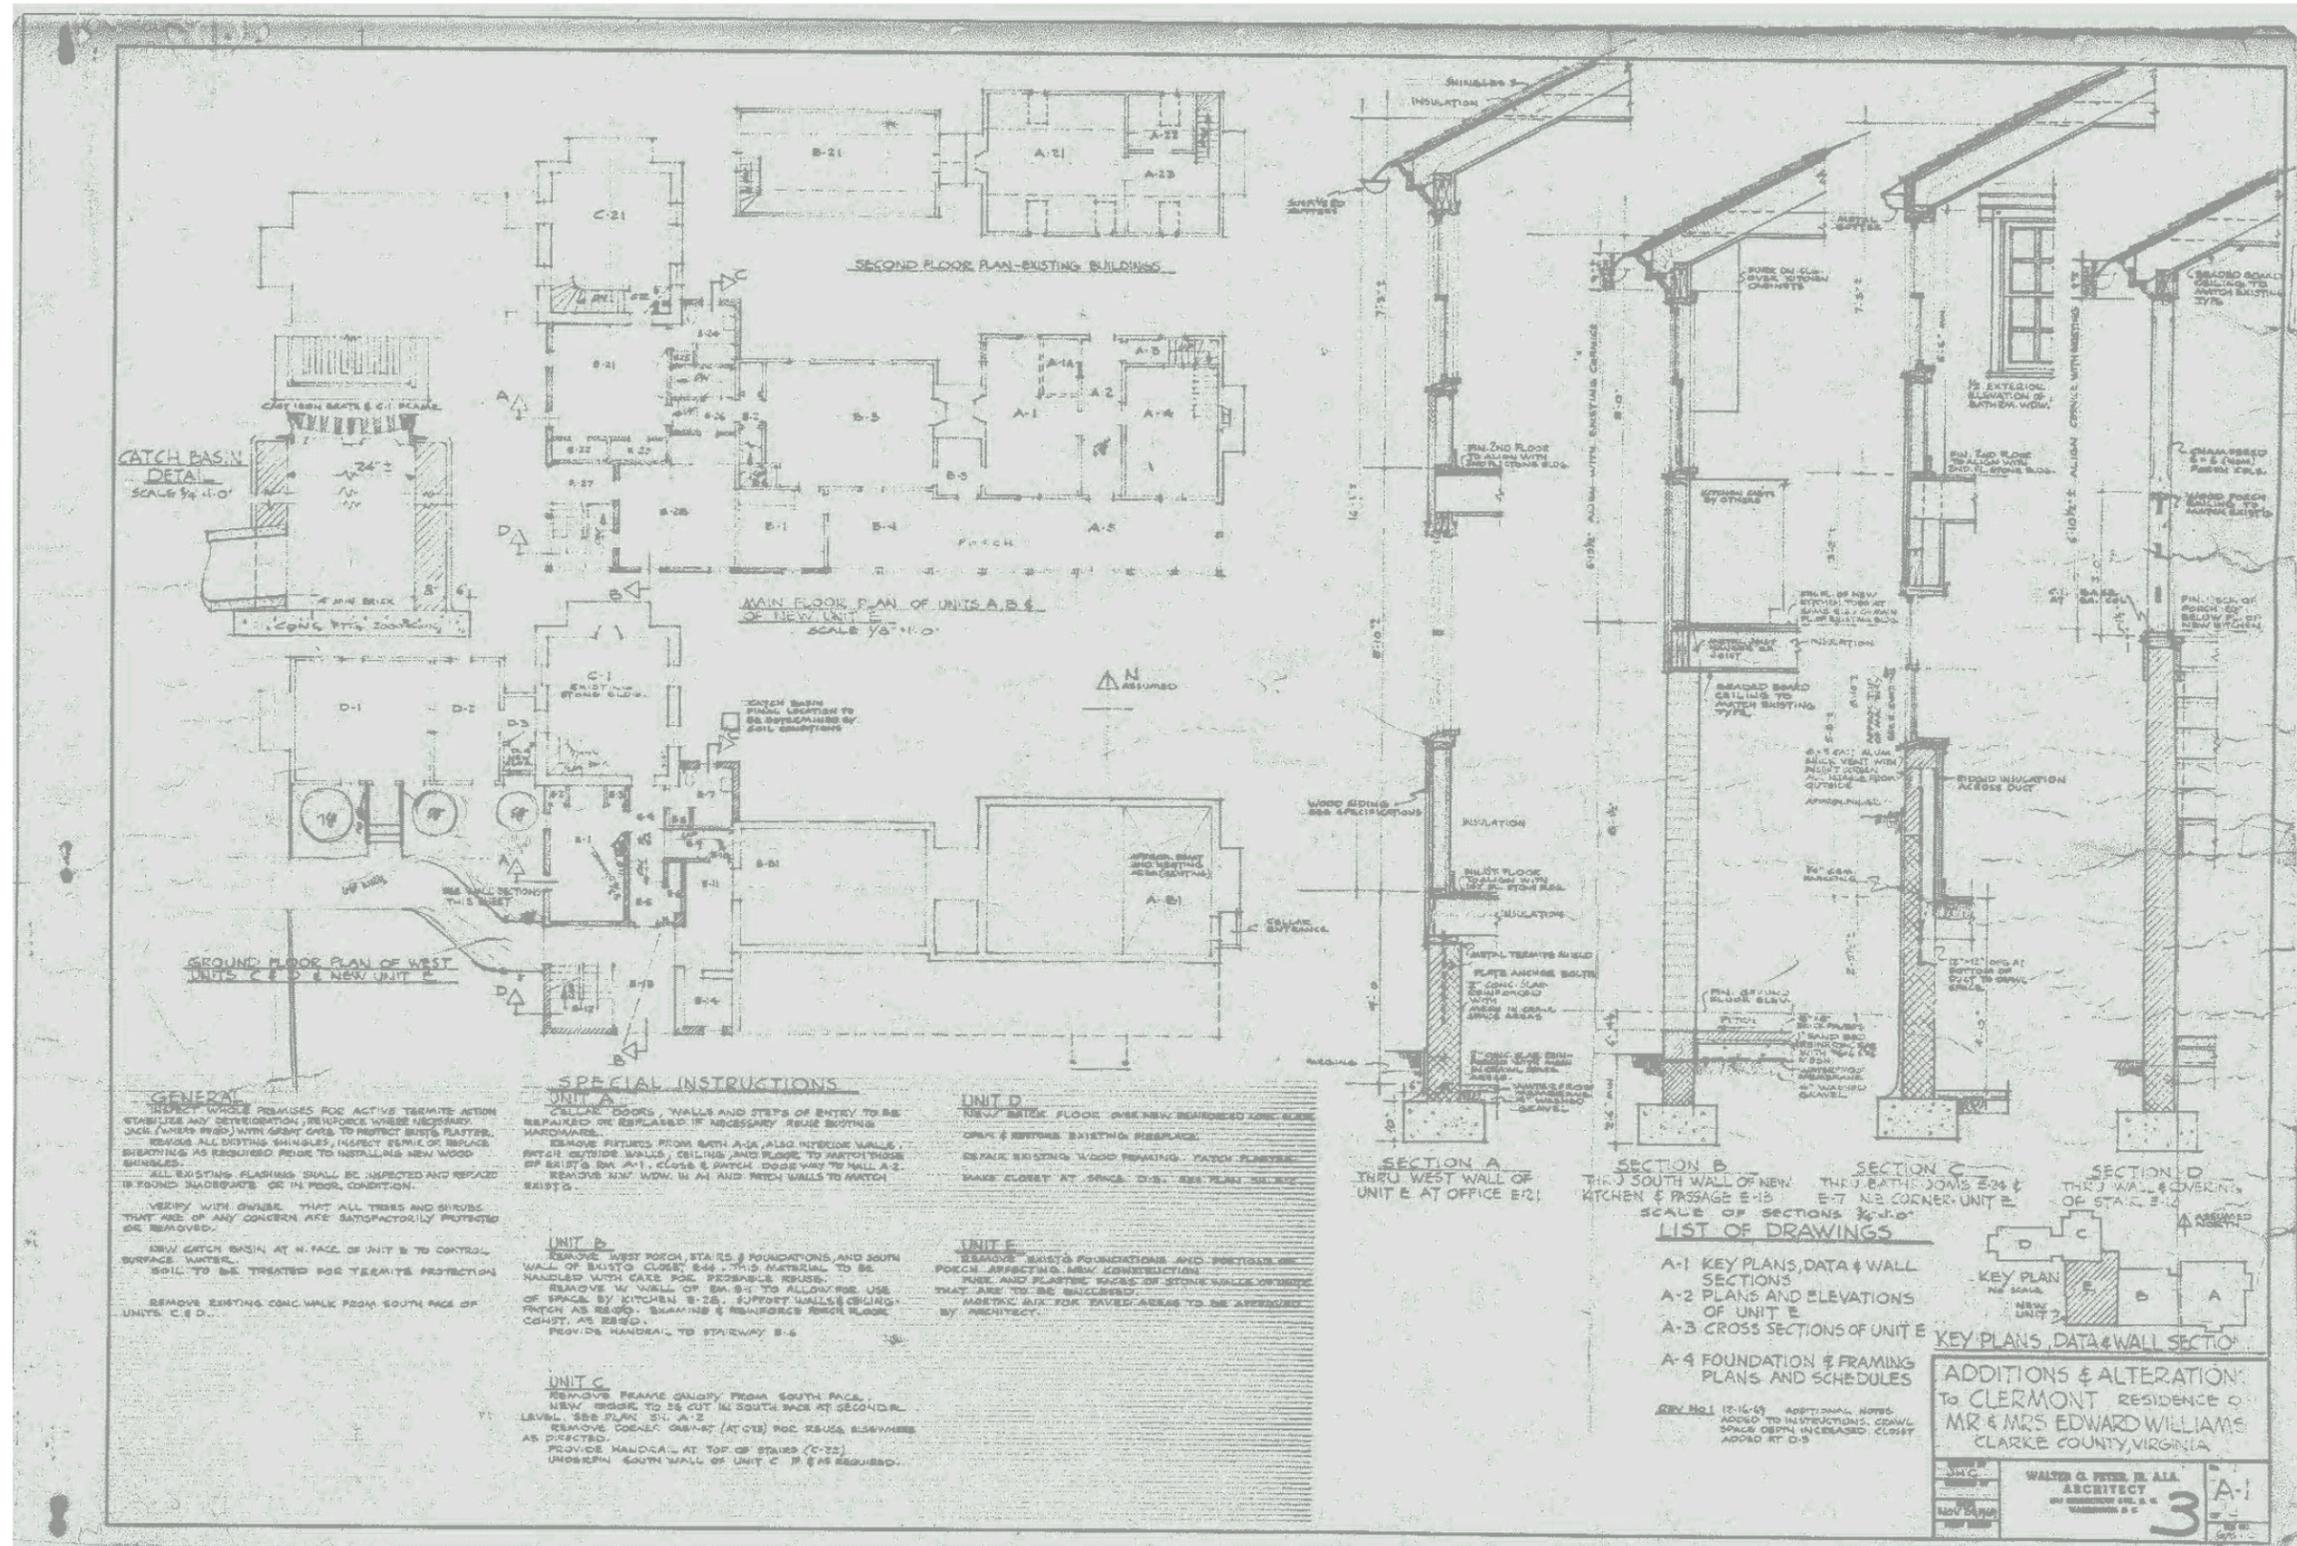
Floor plans, wall sections and notes of the 1969 additions and alterations construction drawings (not to scale).
